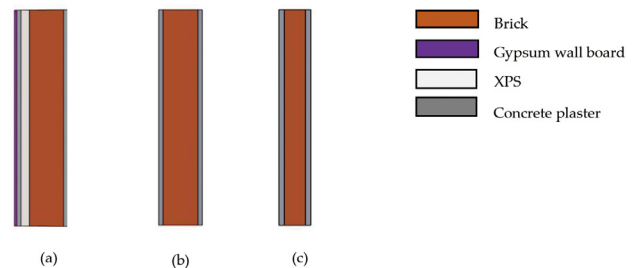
Illustration of typical wall systems used in Egypt residential construction in COMSOL: (a) Wall 1, (b) Wall 2, (c) Wall 3
